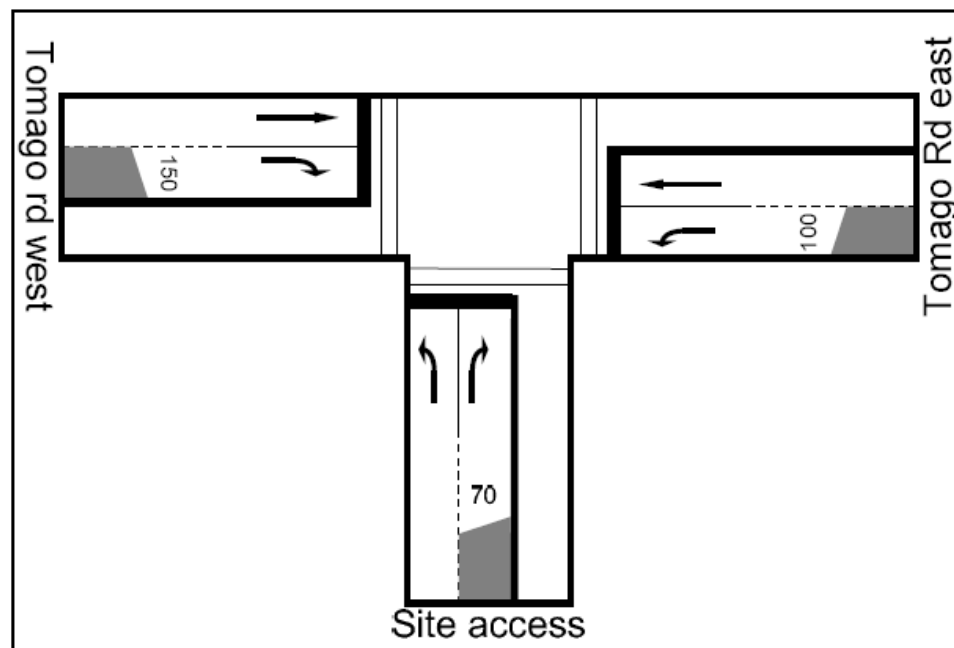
Proposed Conceptual Design of the Site Access – Stage 2
